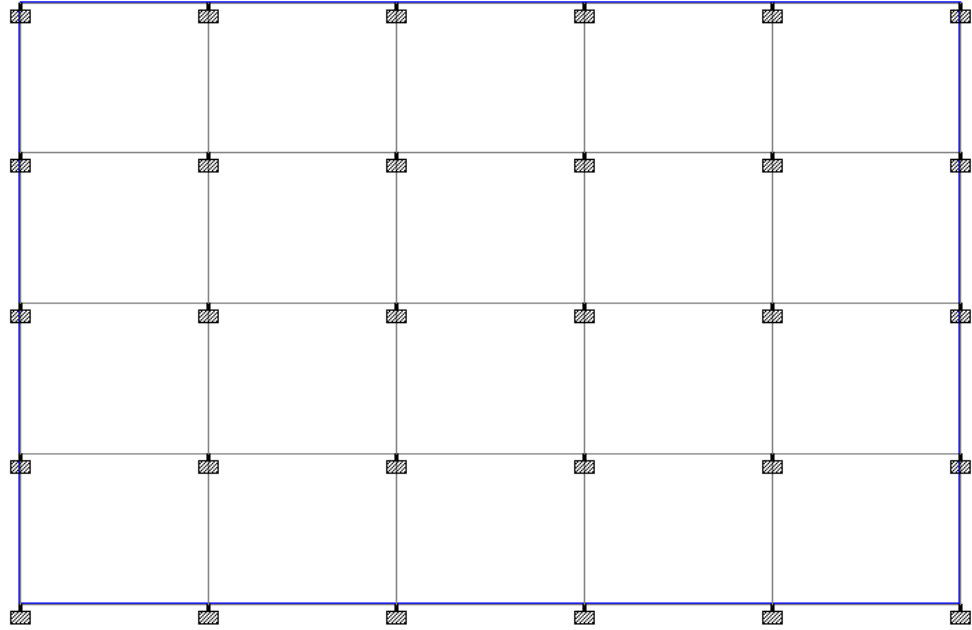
Model 8.3: Masonry infill as surface element – Plan View
